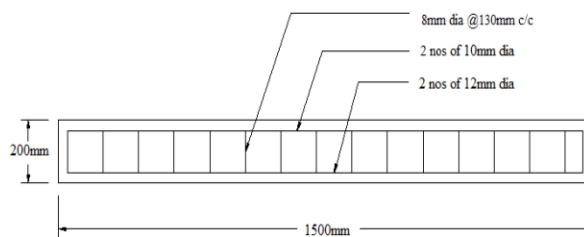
FIG I. LONGITUDINAL REINFORCEMENT OF BEAM
